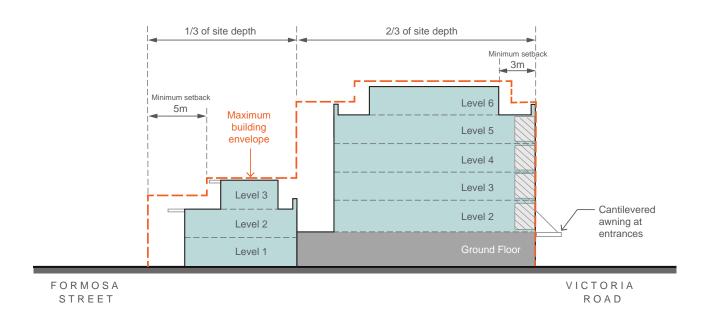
Victoria Road Drummoyne Area D - Maximum Building Envelope Section
